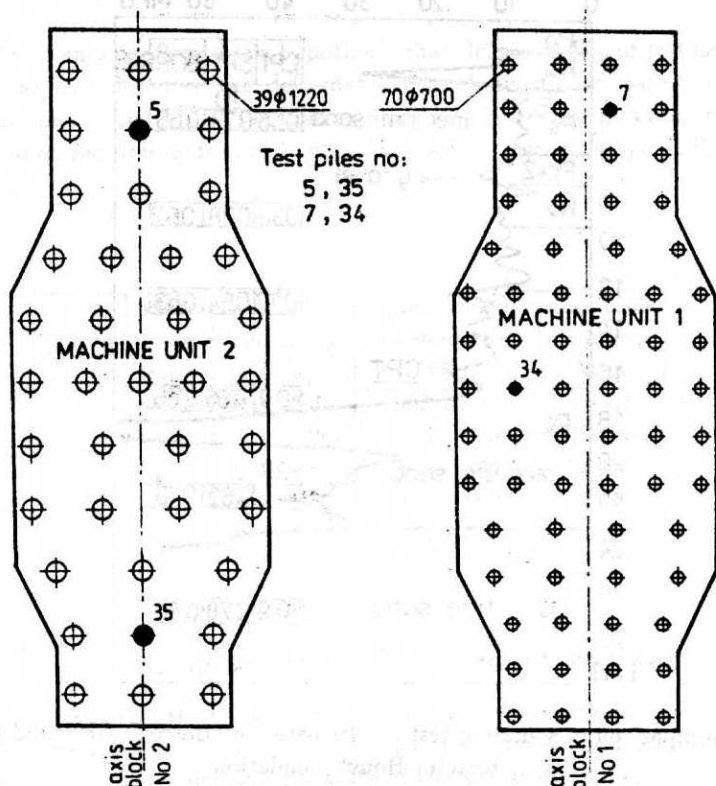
Piles situation under the foundation of Generating Units Nos. 1 and 2 (Engine Room Building I)
